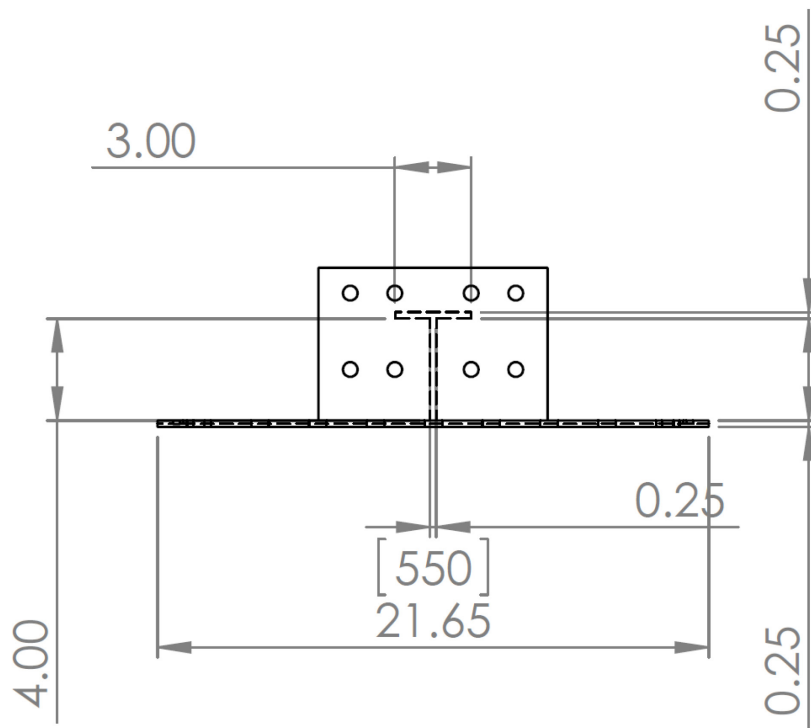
End view of frame test specimen (units are inches; bracketed units are mm).
